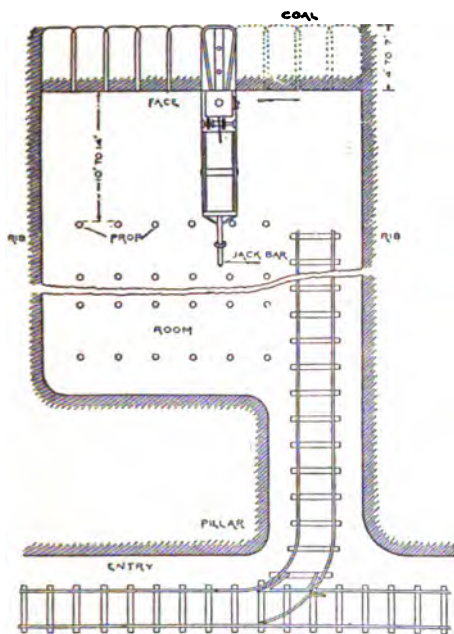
ROOM-AND-PILLAR MINING WITH BREAST MACHINE.
